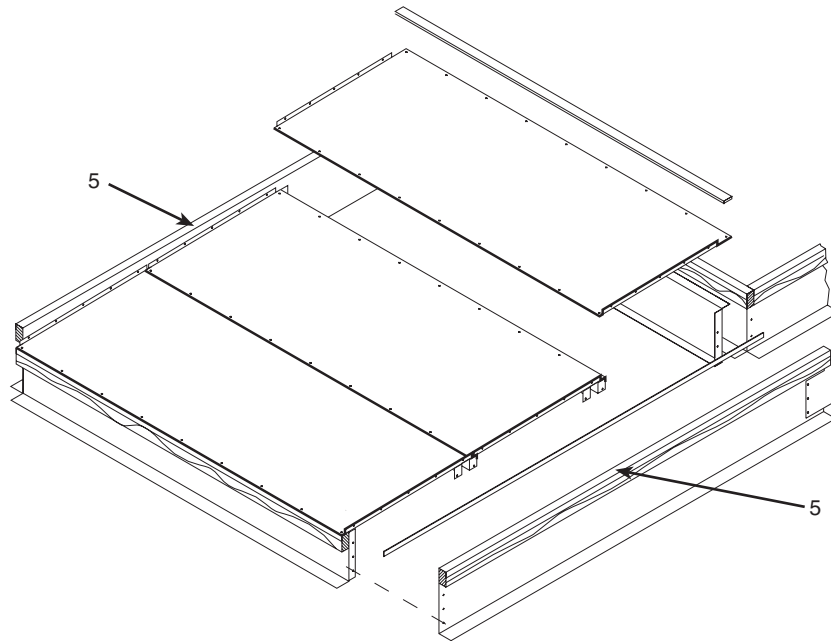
Gasket Location — Condenser Section Roof Curb (Size 055-105 Units)
